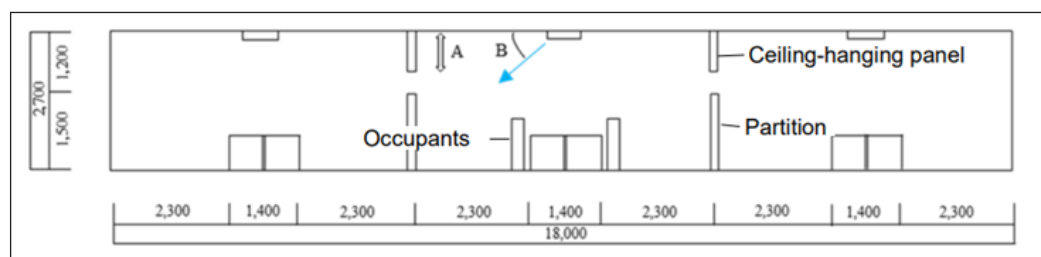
Cross-sectional view A-B (north-south center) in Fig. 4. A represents the ceiling-hanging panel length from the ceiling to the floor, and B is the air-conditioning unit blowout angle from the ceiling
